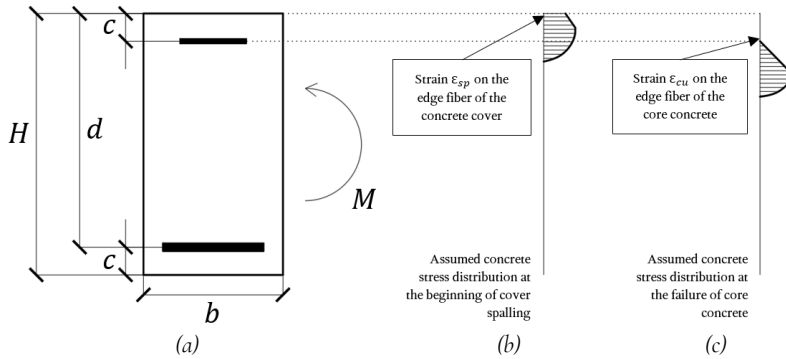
(a) Considered section layout; (b) Concrete stress distribution at beginning of cover spalling; (c) Concrete stress distribution at failure of core concrete
